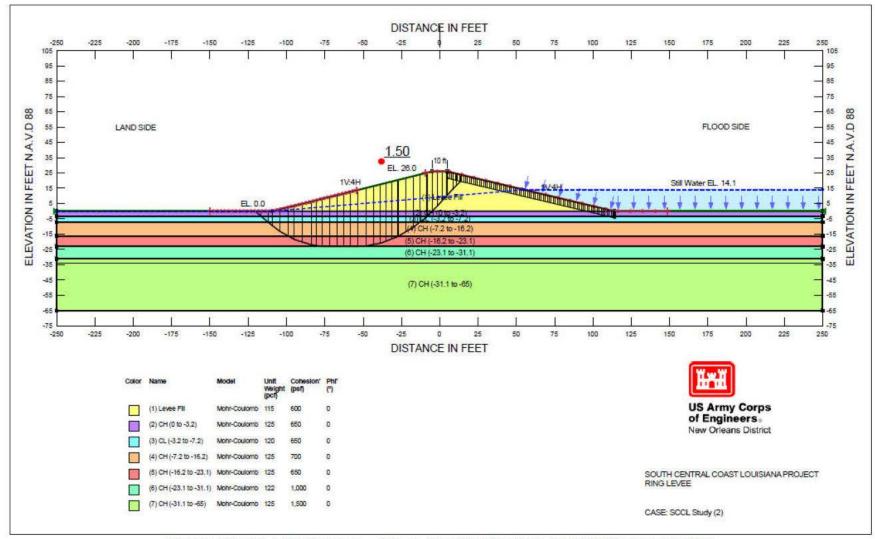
Ring Levees - Slope Stability Analysis for Still Water Elevation
